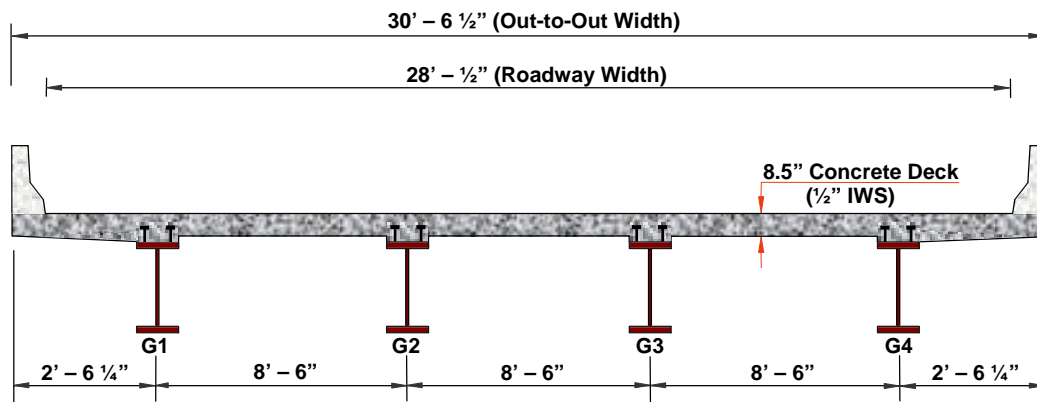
Bridge Cross-section with 28-ft. Clear Roadway Width
